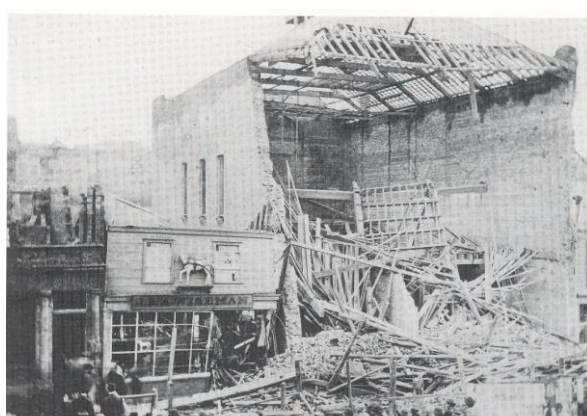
Collapse of a new masonry auction market building, Queen Street, 1865 [Alexander Turnbull Library].
